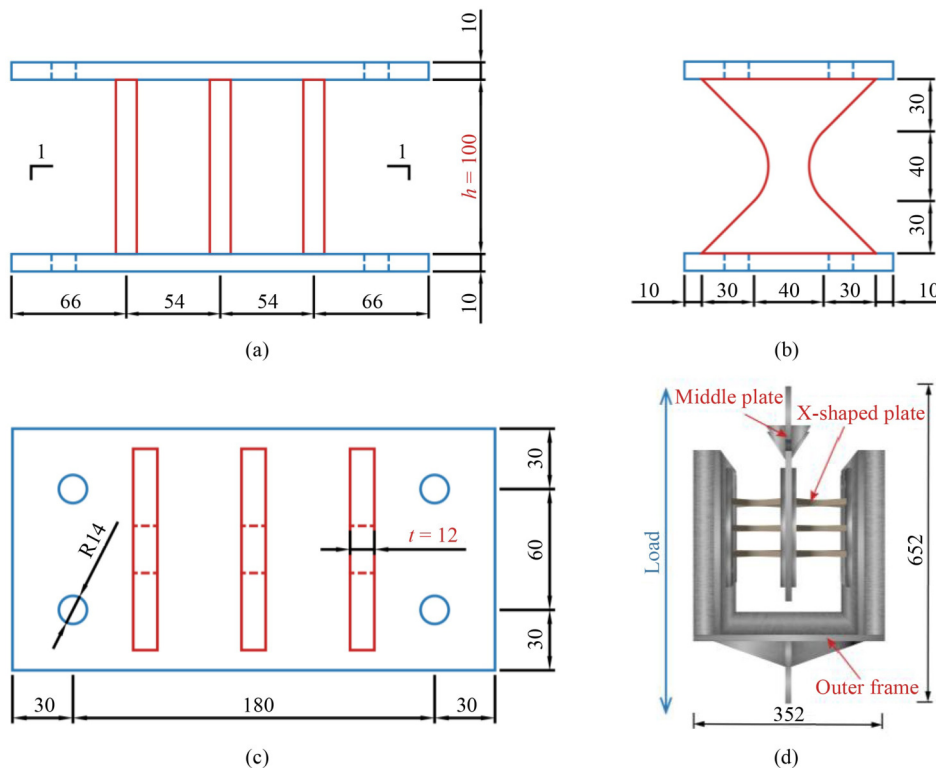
Constructing style charts (unit: mm): (a) front view; (b) side view; (c) 1-1 cross-section; (d) configuration of specimen.
